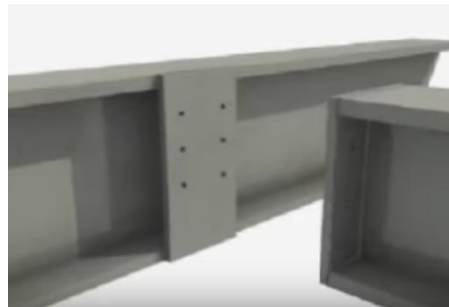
Connection with a welded bracket or plate on the supporting beam.
